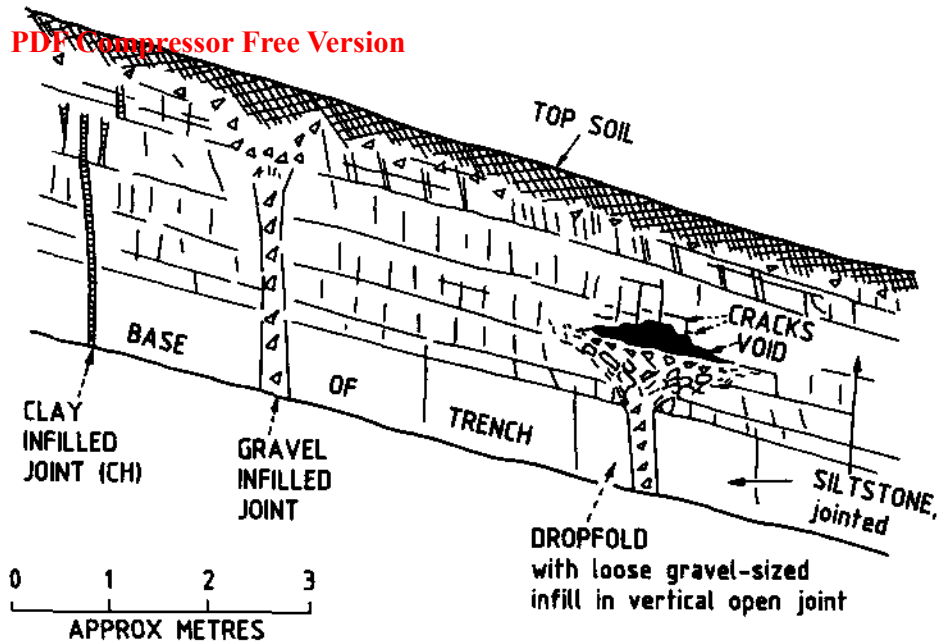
Features exposed in trenches on a left bank dip slope at Sugarloaf Dam.
